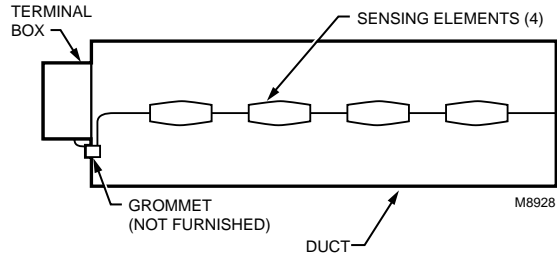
Duct cross section showing method of installing C7031J Sensor in a multizone system.
